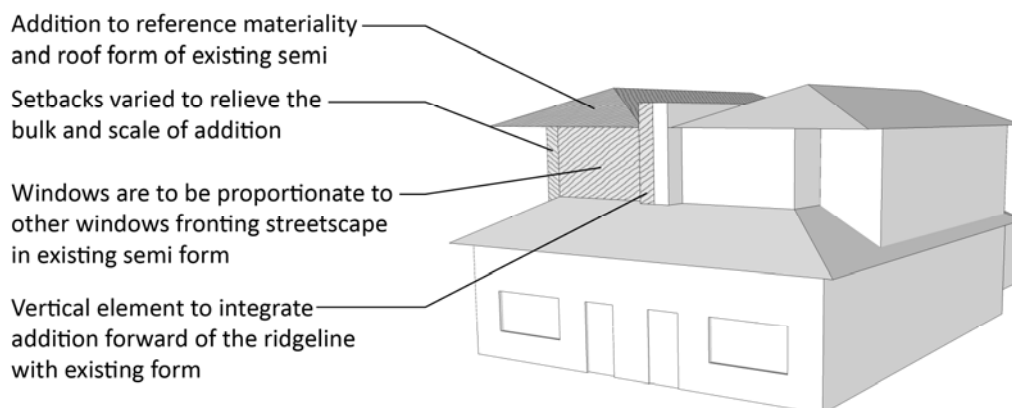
First floor addition projecting forward of existing ridgeline of semis pair
